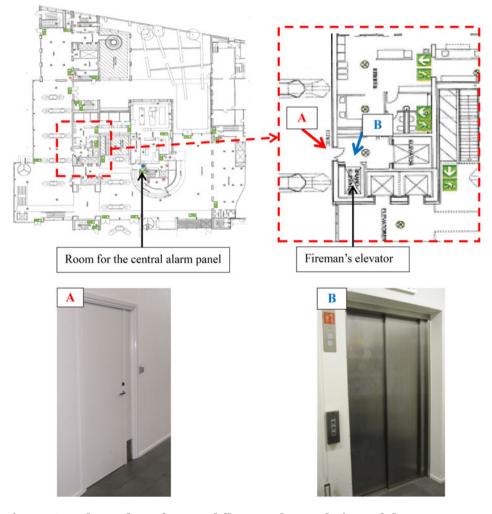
Floor plan of ground floor and actual view of doors to reach fireman's elevator [22].
